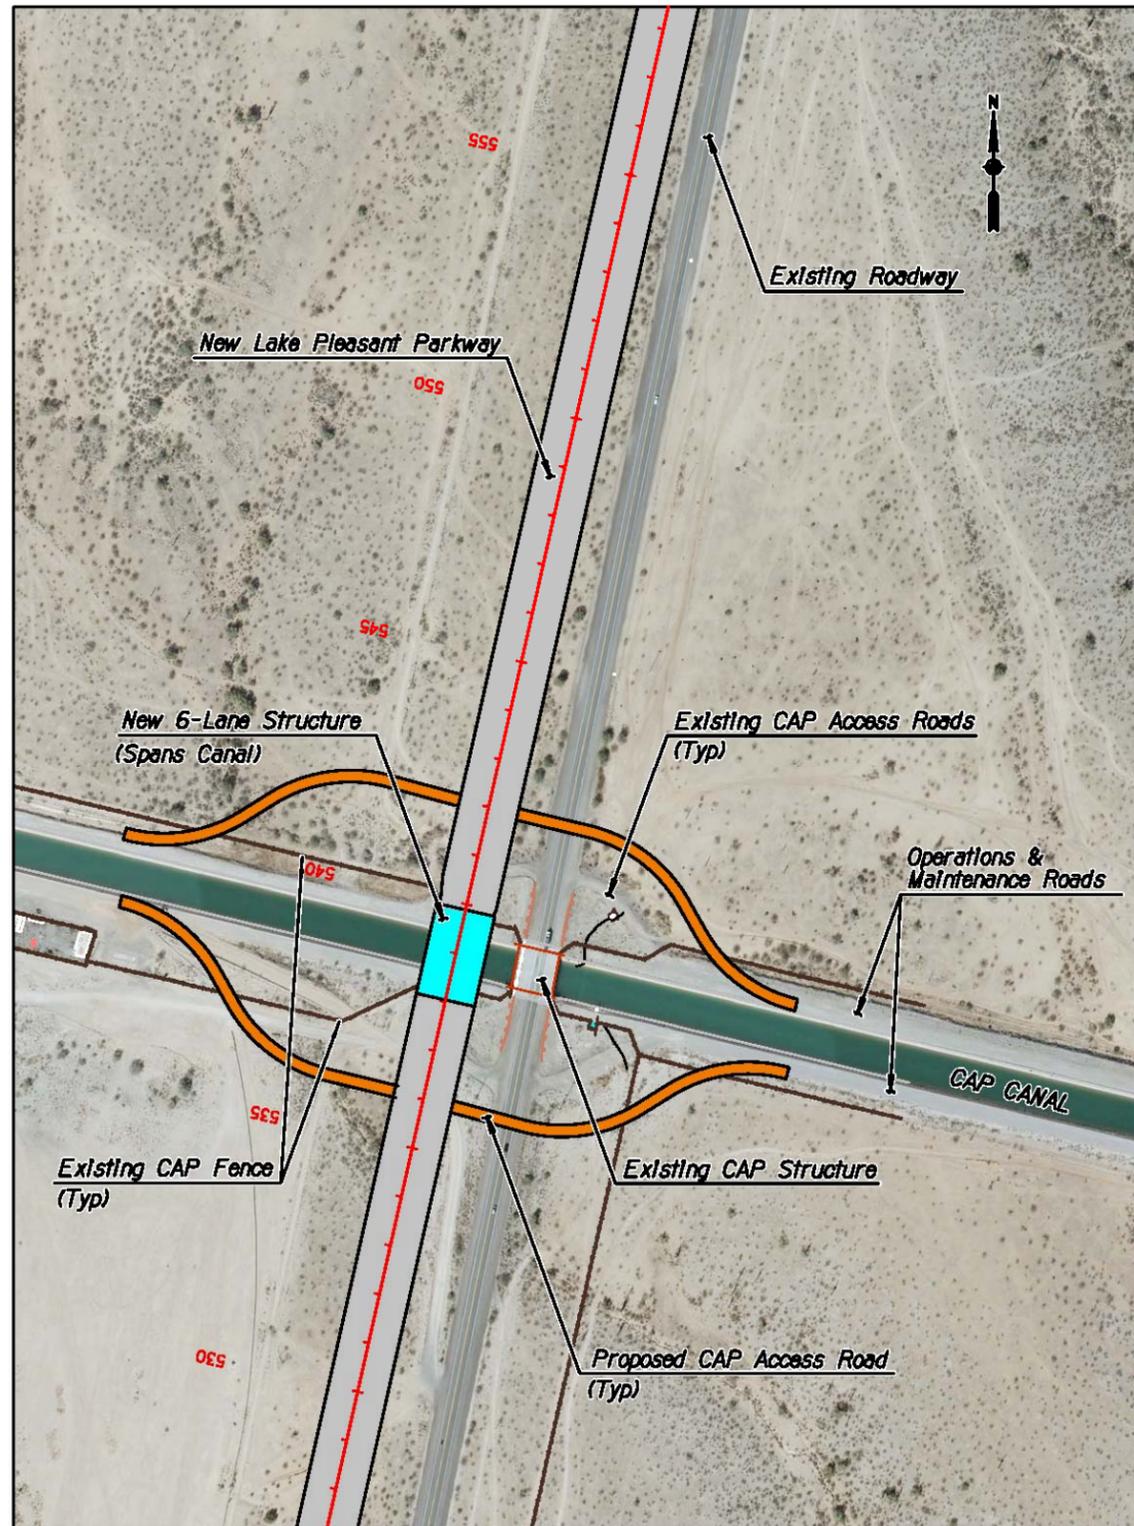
CAP Alternative 4: Tunnel O & M Roads
